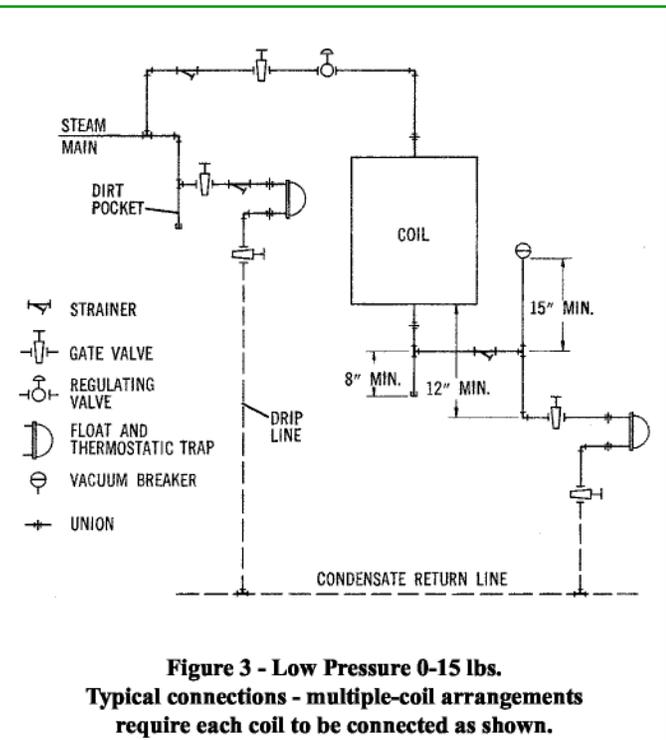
Low Pressure 0-15 lbs. Typical connections - multiple-coil arrangements require each coil to be connected as shown.
